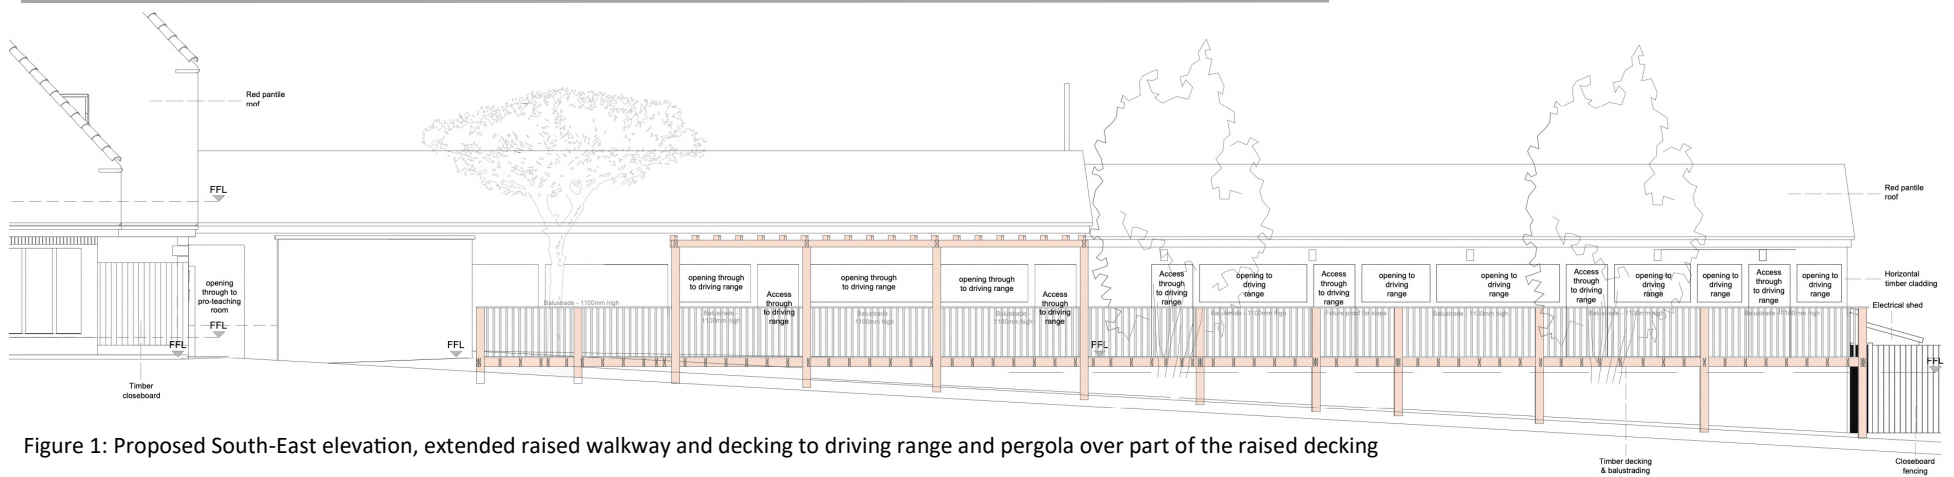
Proposed South-East elevation, extended raised walkway and decking to driving range and pergola over part of the raised decking
